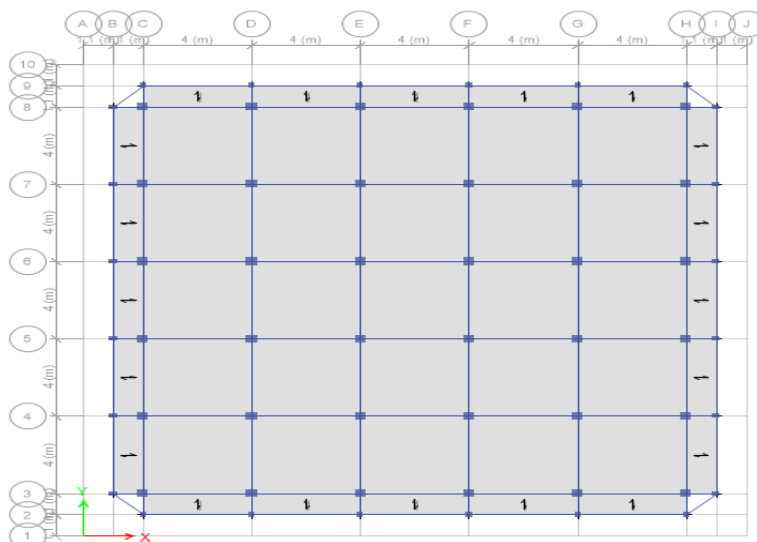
Typical Plan at Storey 8 with Cantilevered offset - Type F Model
